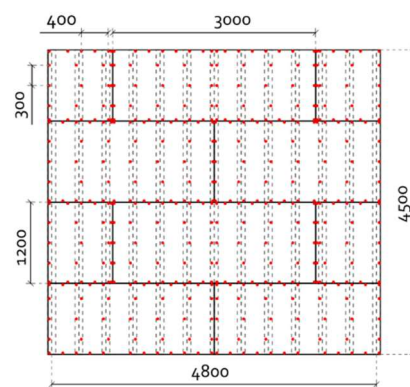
Pattern of connectors between the steel deck sheet to type 1 steel frame
